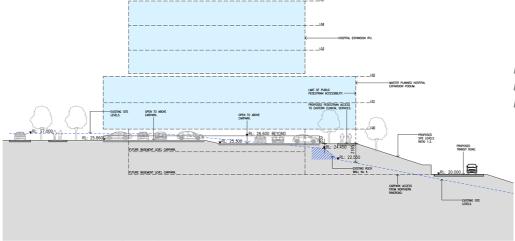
Wall 4 section, showing the location of the wall and new ground levels
